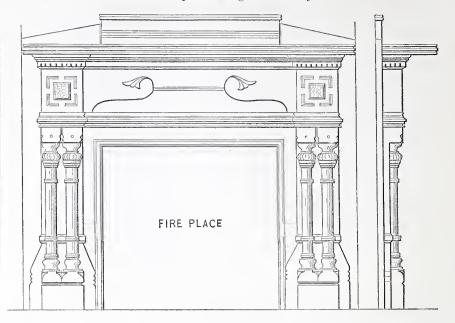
Elevation and Section of Parlor Mantel.-Scale, 3/4 Inch to the Foot.
